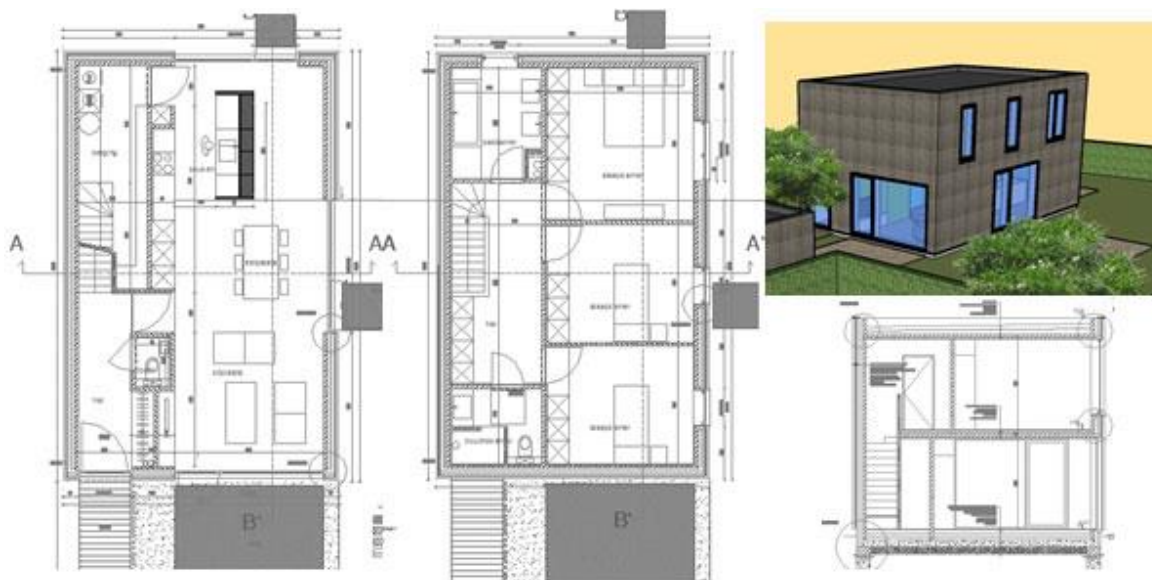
Case study project in Moorslede, Belgium: Floor plans, section, visualisation.
